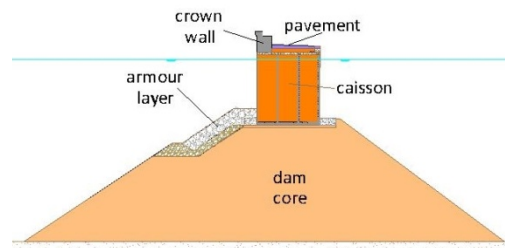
IMPRESSION BOTTOM FOUNDED BARRIER, CROSS-SECTINAL VIEW (FUENTES 2014)
